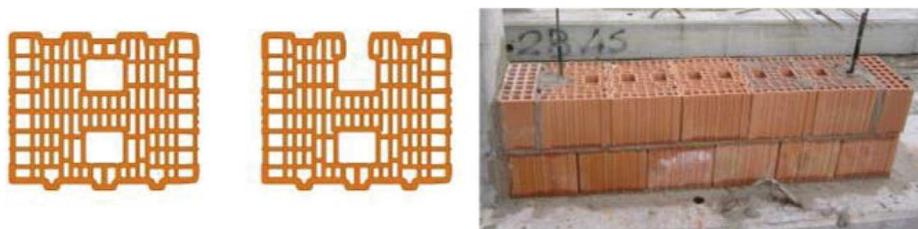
Replacement of existing envelope by reinforced masonry (RM) infill walls [95] - CC BY 4.0.
